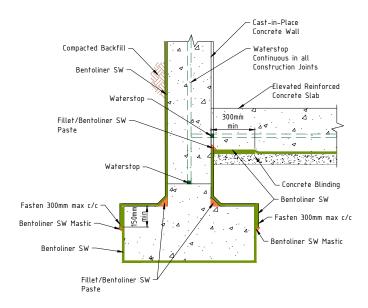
Raised slab detail with concrete blinding at hydrostatic condition
